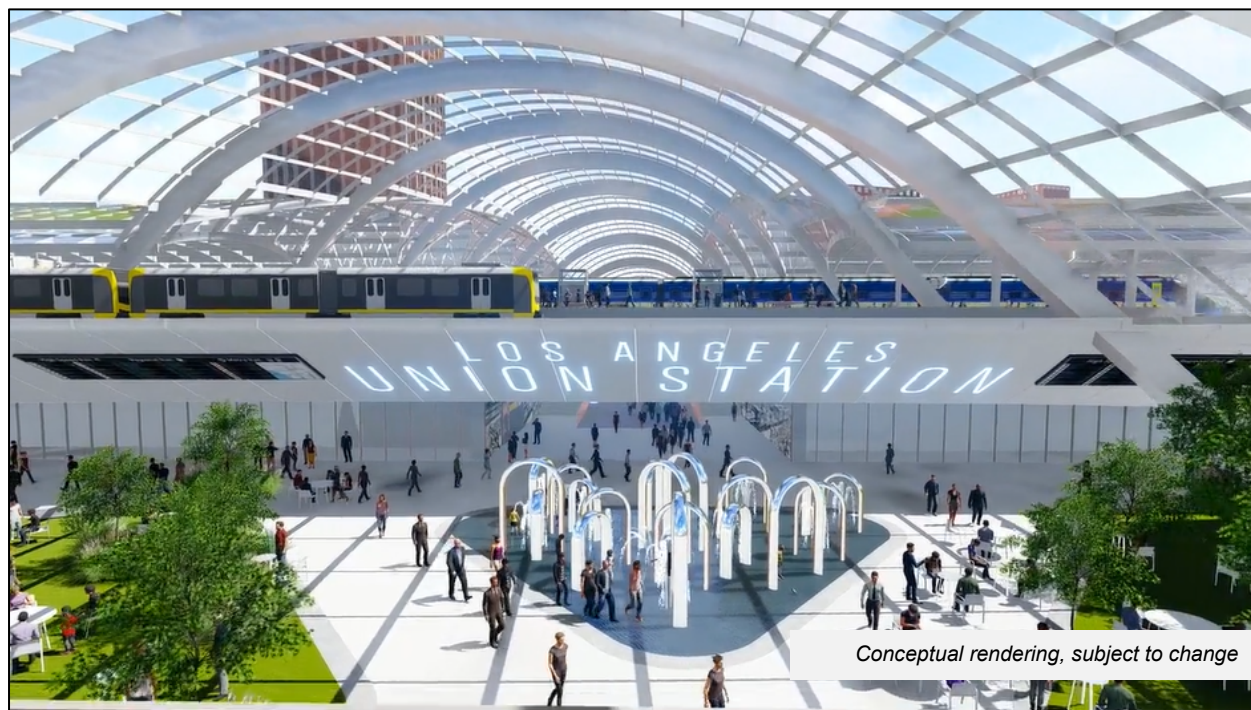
View B – Expanded Passageway under Gold Line Platforms Looking West
